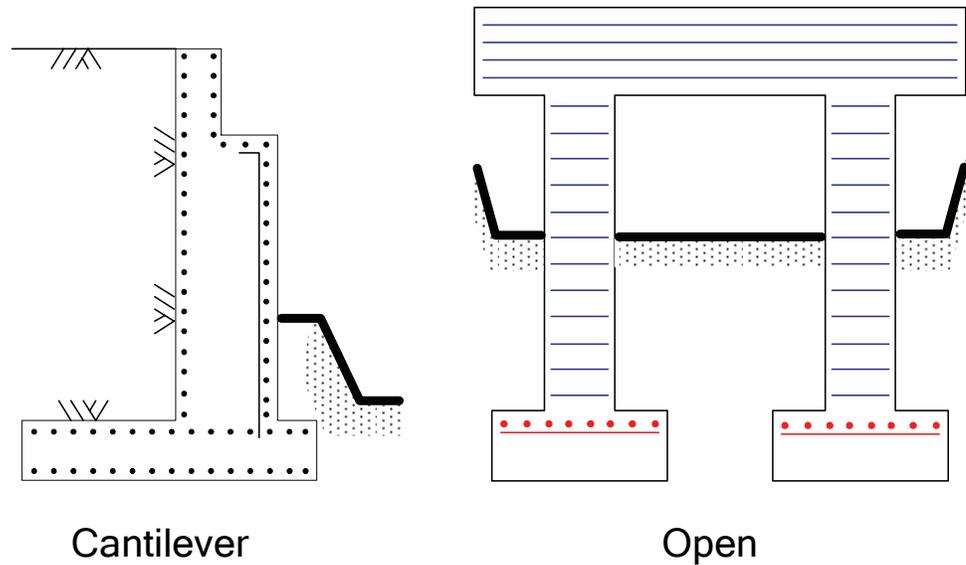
Secondary Reinforcement in Concrete Abutments
